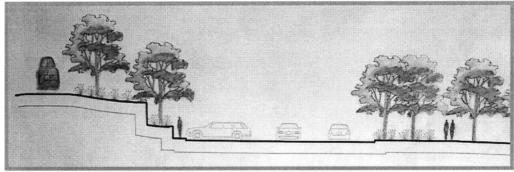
Portion of section/elevation C-C1 showing parking area relative to CP Rail Line
